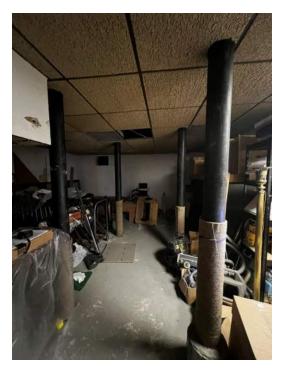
IMG_1669– Basement – South back room (below office) – Contains steel lally columns with non-uniform spacing. Column placement and spacing suggests additional columns were added for reconfiguration of openings on first floor,
